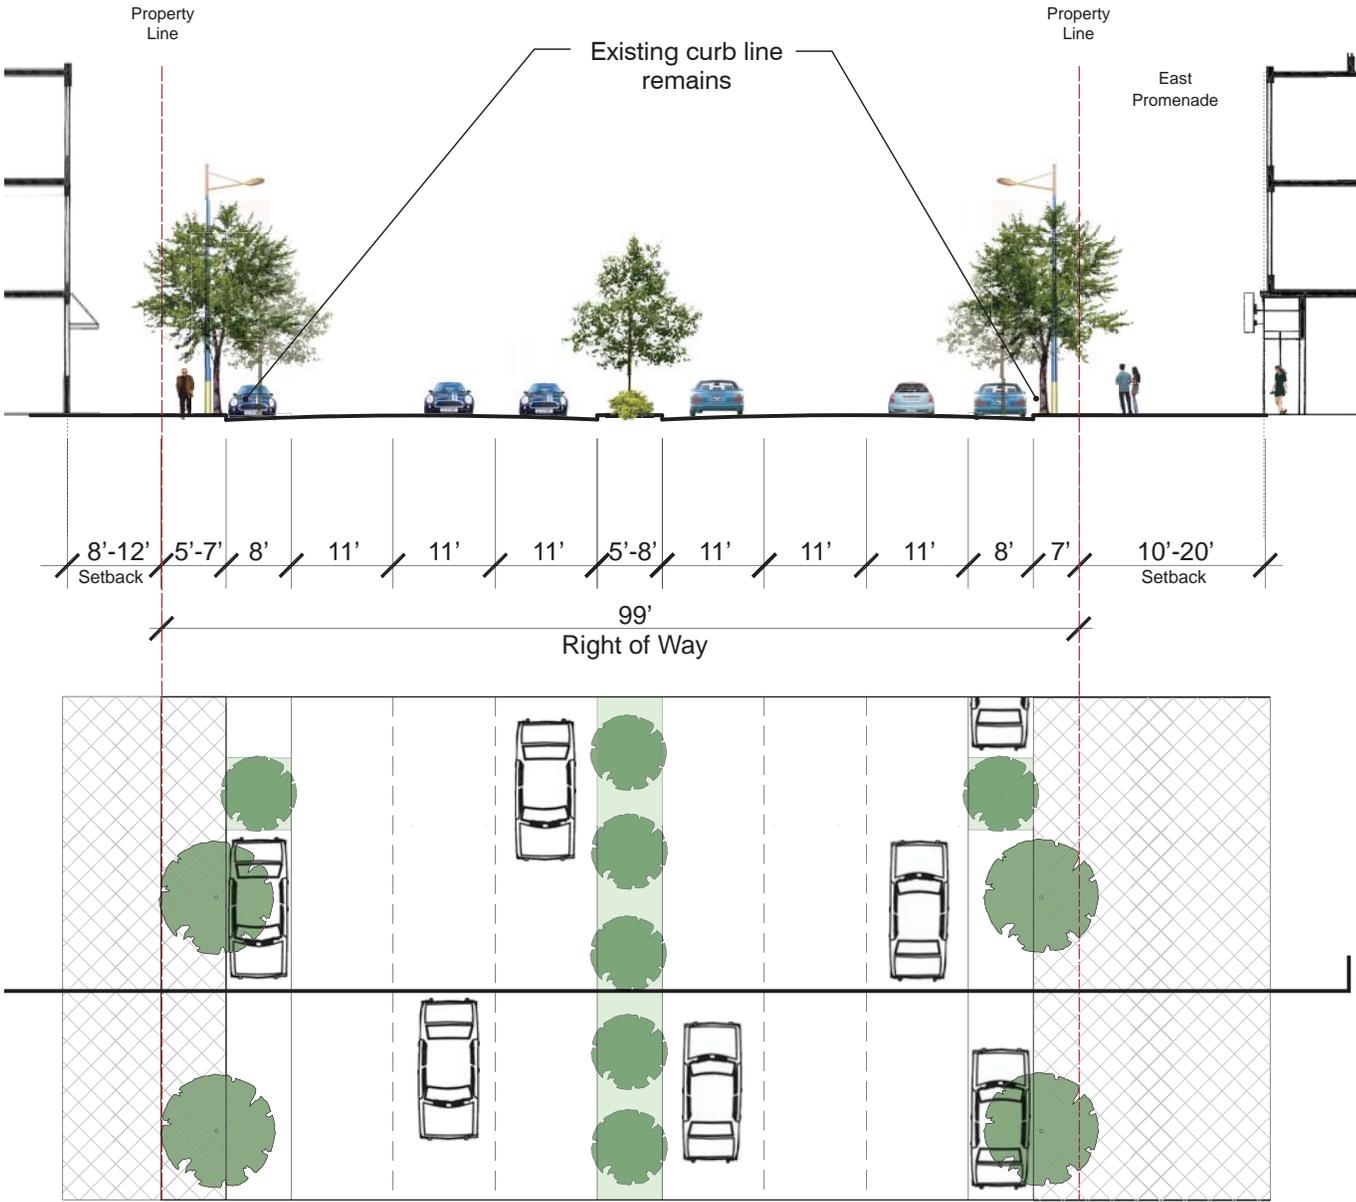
Typical section/plan at El Camino Real south of Roble Avenue
